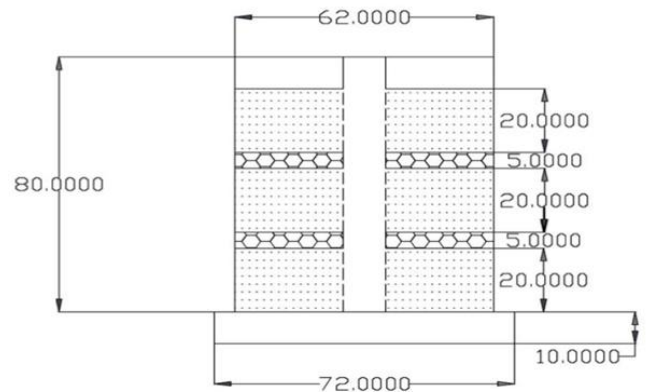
Designed ZECC sectional view (Dimensions in cm)
